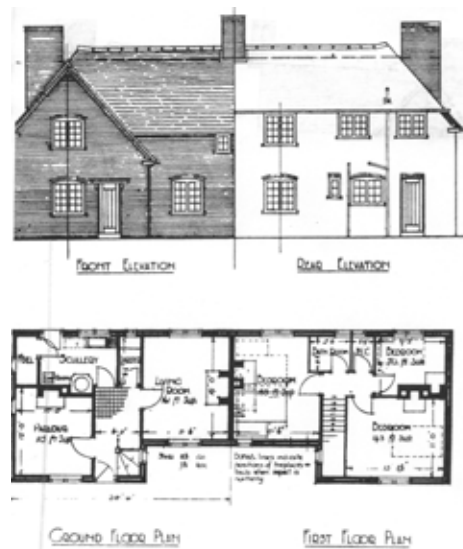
Type Plans and Elevations (1920): typical L-shaped plan with broken eaves-lines (south aspect)
